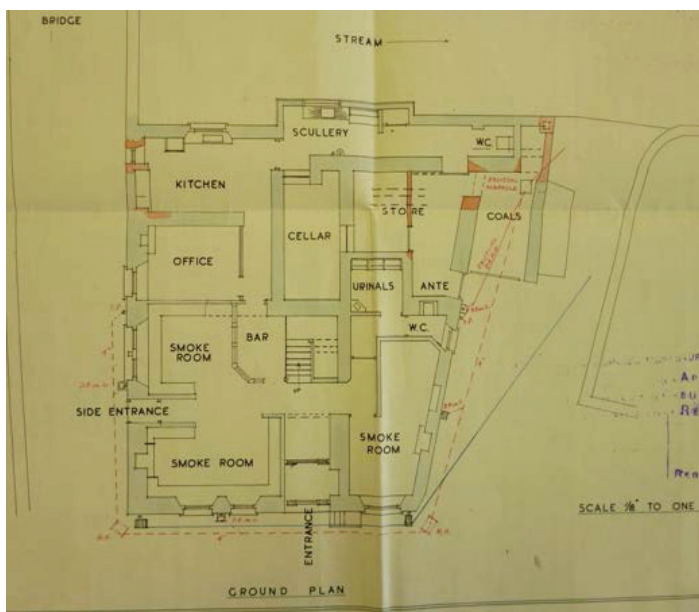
(left): Proposed ground floor plan (CAC(B) BSRDNL/3/1681 1939)
